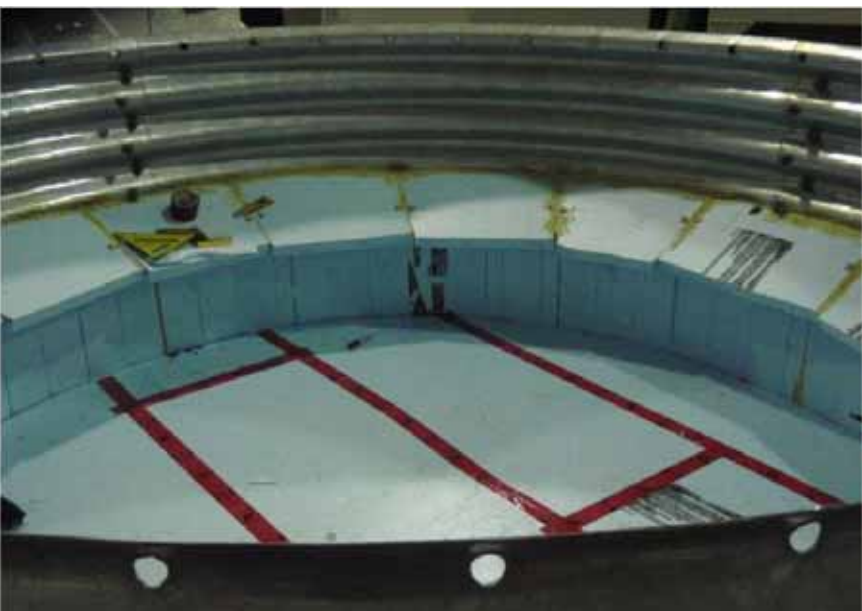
Close up view of insulation installed in the base of a Doris North Camp sump. Note that additional pieces of insulation have been placed on the top portions, as requested, to limit the potential for seepage going behind or in-between layers of insulation.
